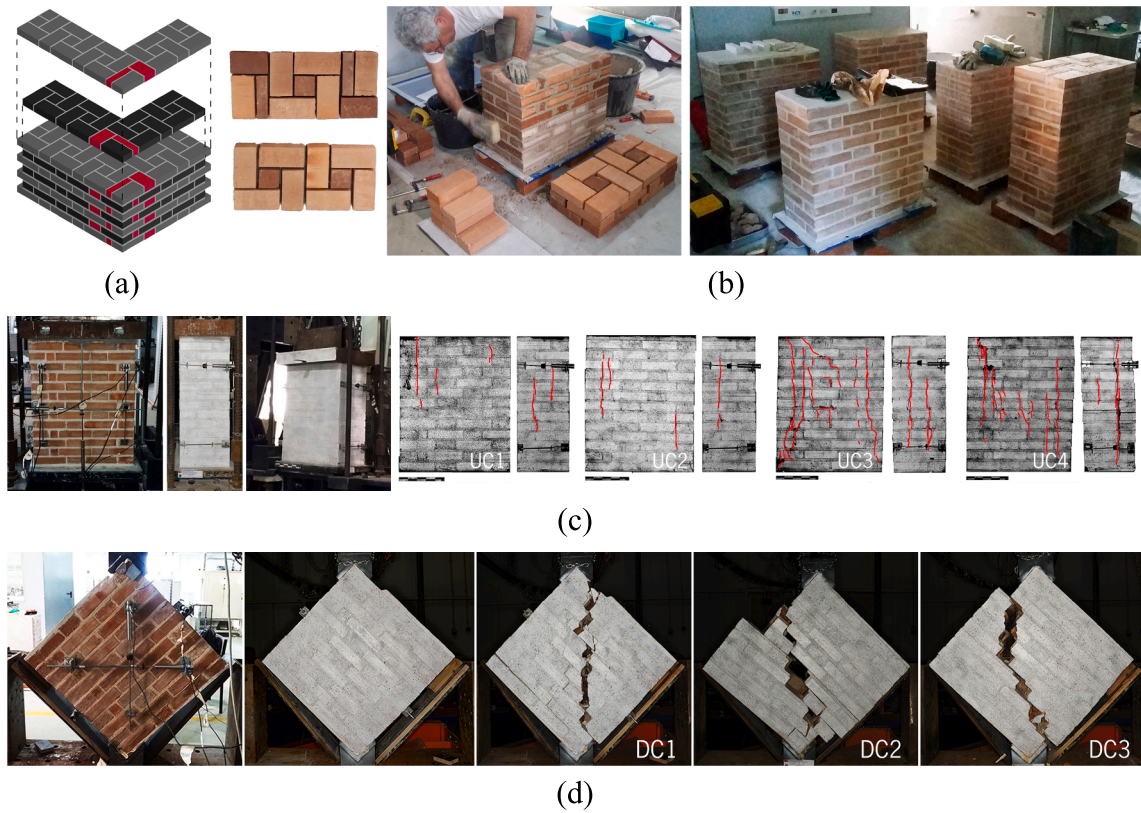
Replicated historic brick masonry: (a) graphic representation of the Flemish brick bond, at corner interlocking, for 1½ brick of wall thicknesses. Note the cut bricks in red. Adapted from [21] and Lacroux et al. [44]; (b) building process of wallets for uniaxial and diagonal compression tests; geometry, instrumentation and setup of uniaxial (c) and diagonal (d) compression tests on brick masonry wallets, with the resulting crack patterns. (For interpretation of the references to colour in this figure legend, the reader is referred to the web version of this article.)
